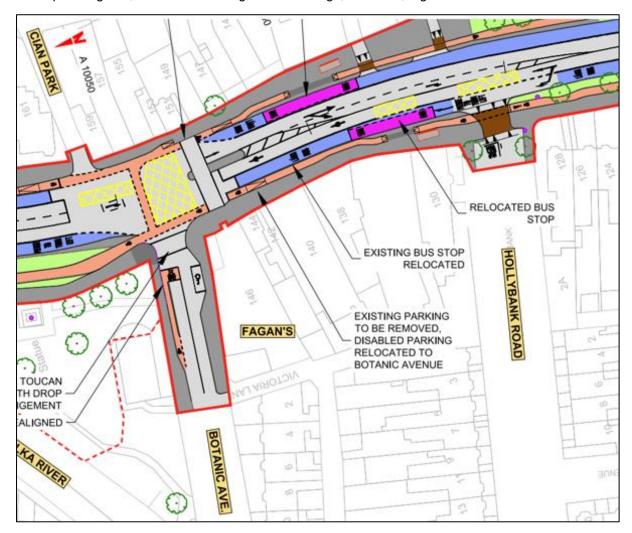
Proposed General Arrangement between Hollybank Road and Botanic Avenue (Sheet 31)
